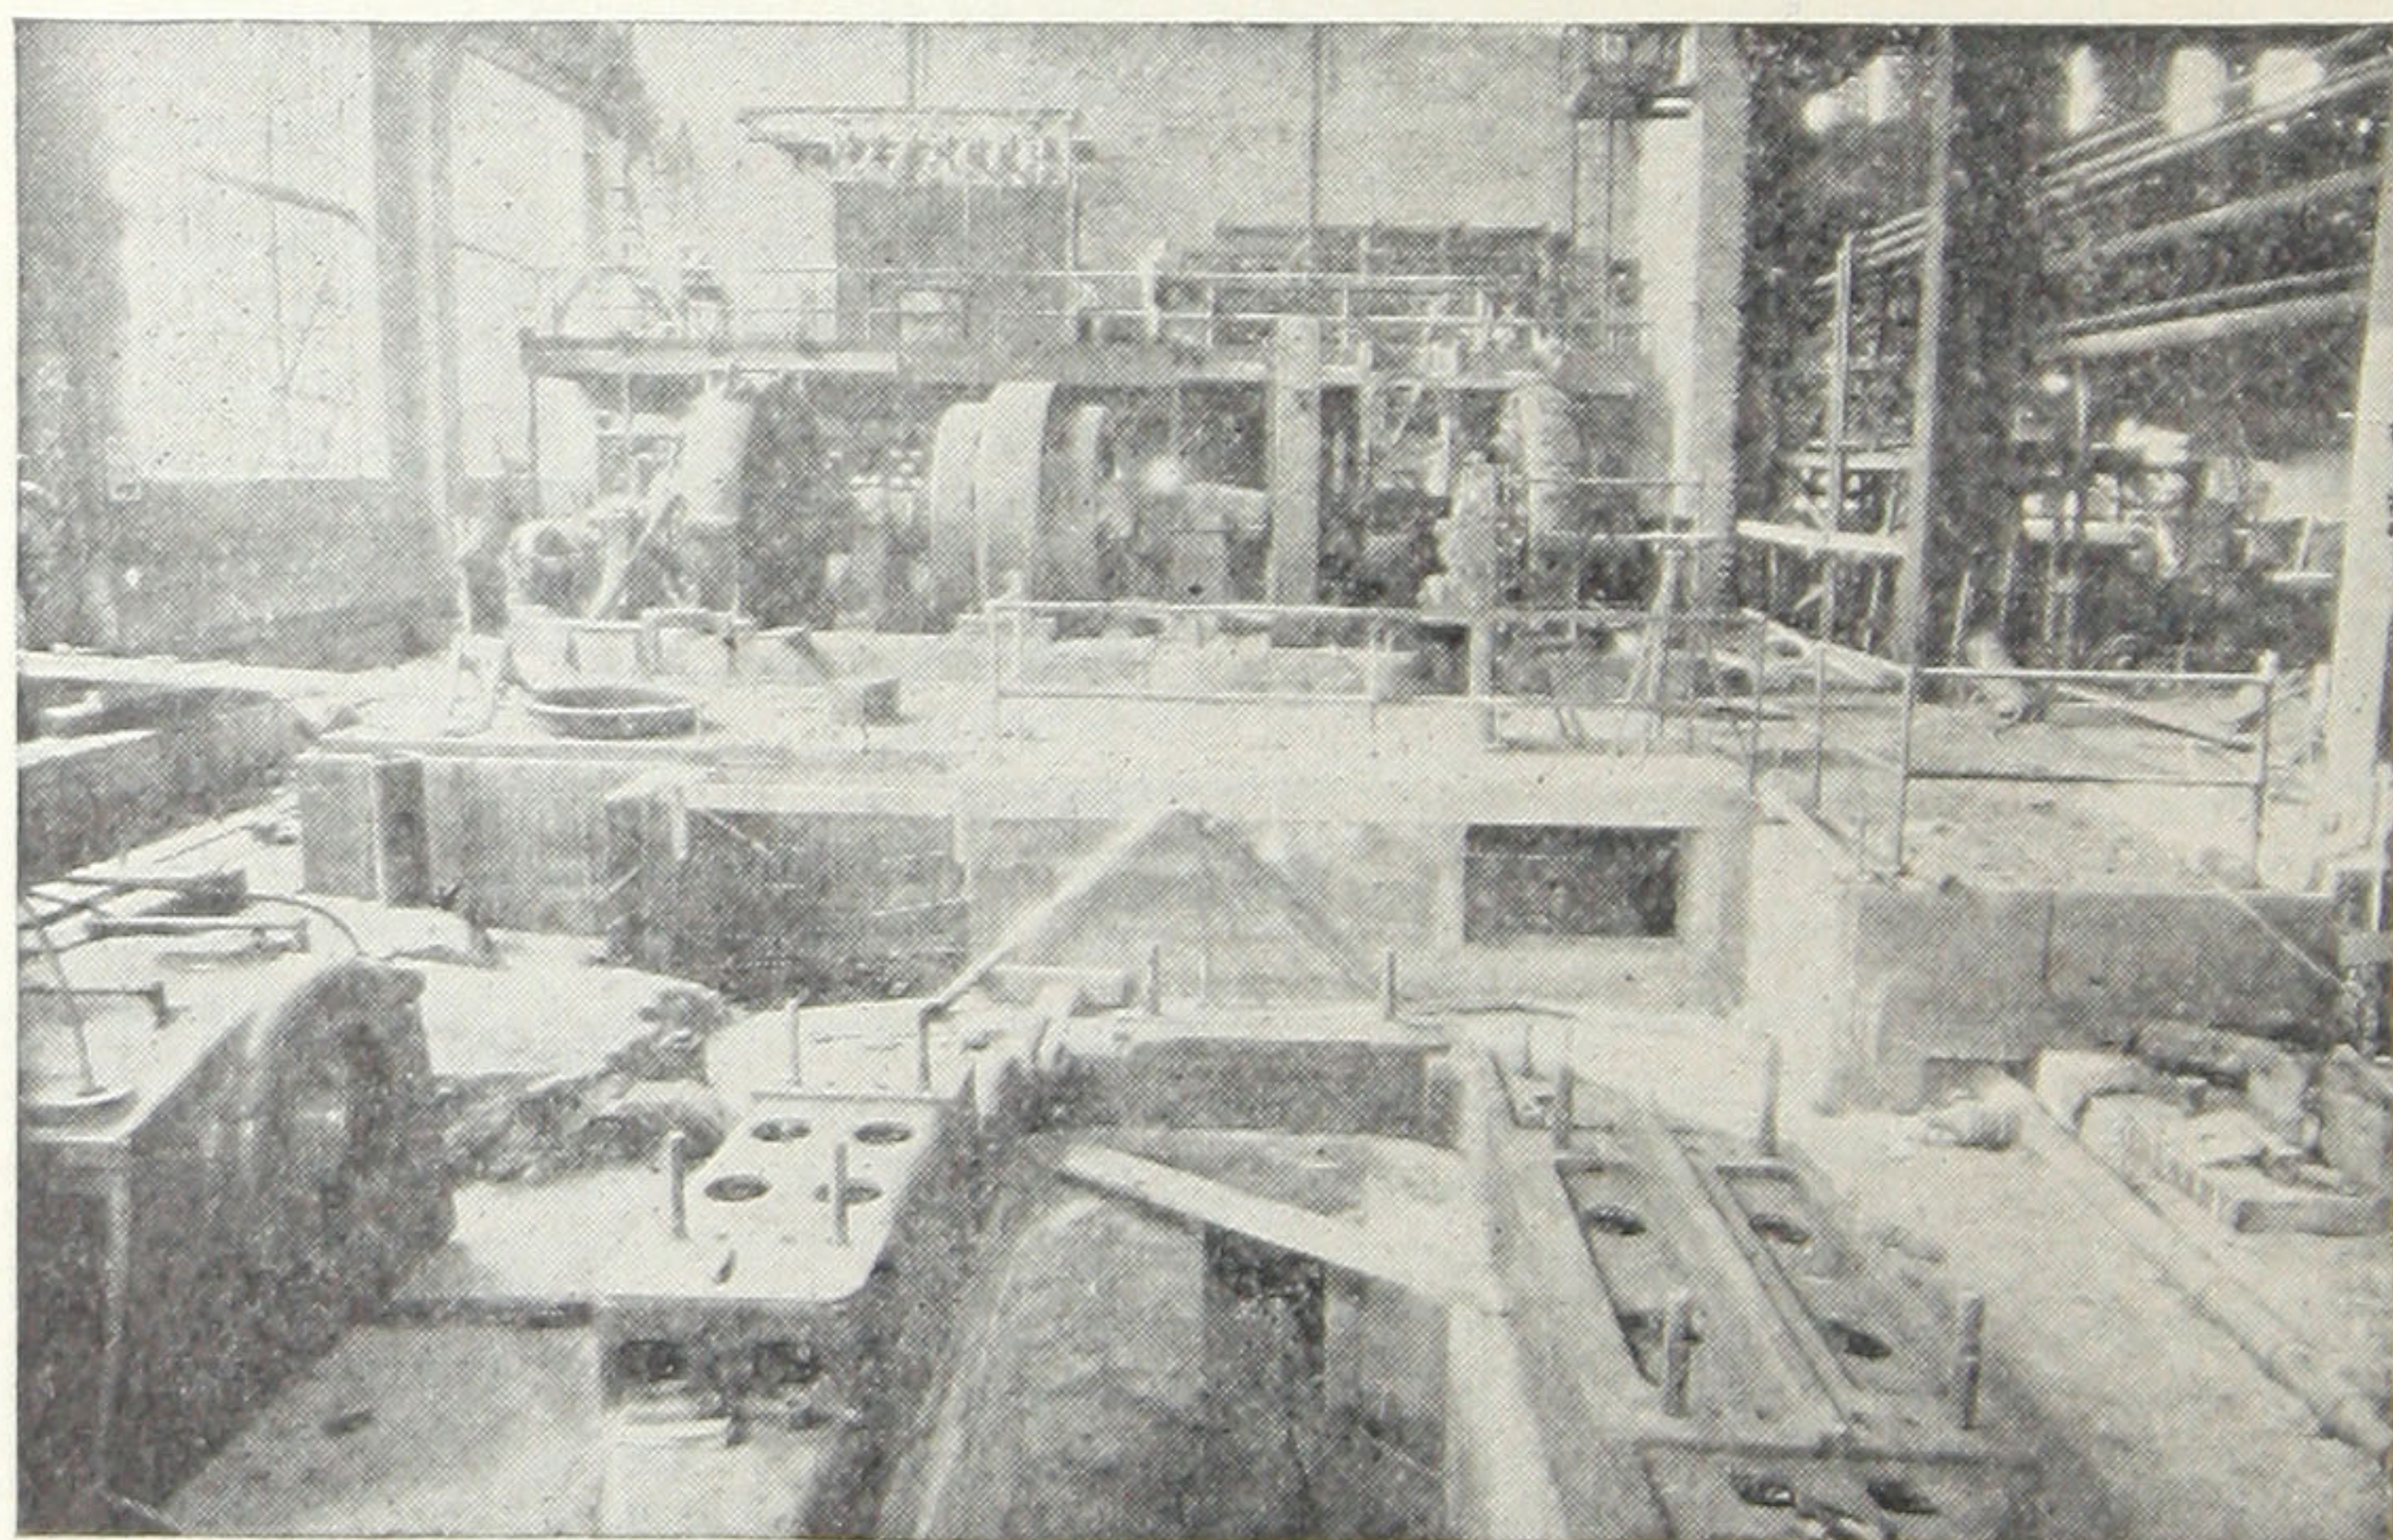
Large engine foundations made with Lumnite Cement permitting the installation of the heavy machinery loads within 24 hours after pouring.
